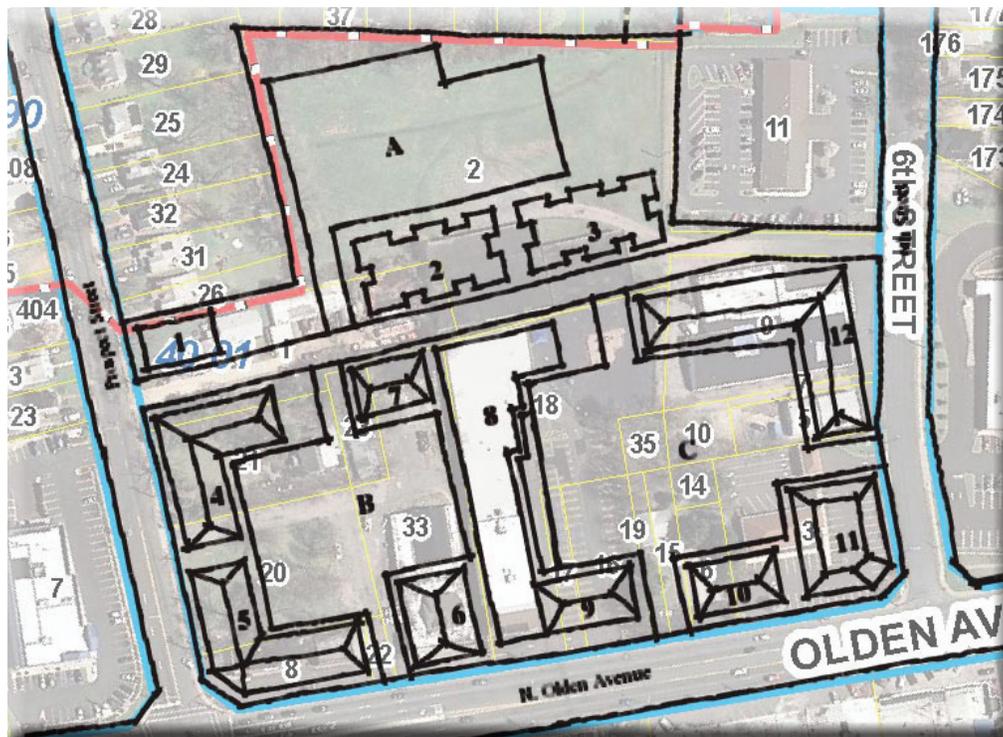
Sixth Street to Prospect (North Side Development Potential) Notice how through simple design measures that orient buildings to the street, that parking availability grows through the efficiency in the layout
